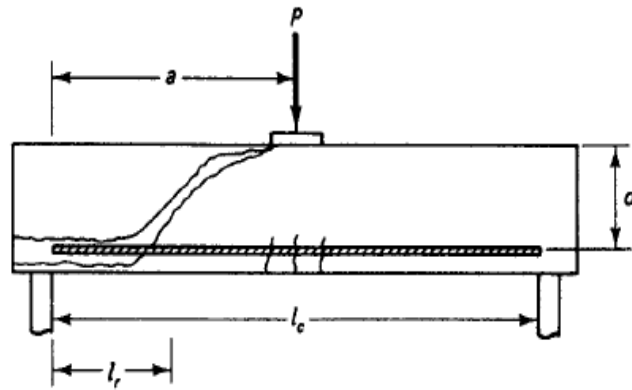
Diagonal tension failure of concrete beam, cracking development (Nawy, 2009).
